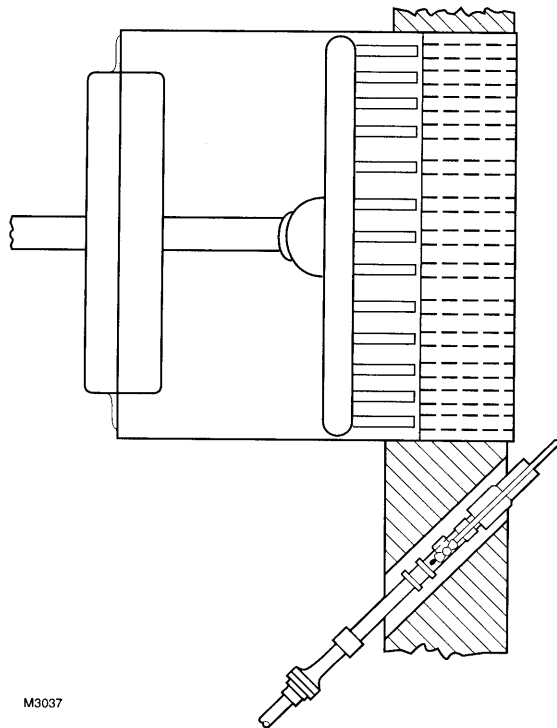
Typical mounting of gas pilot and flame rod assembly on radiant inshot type burner.
